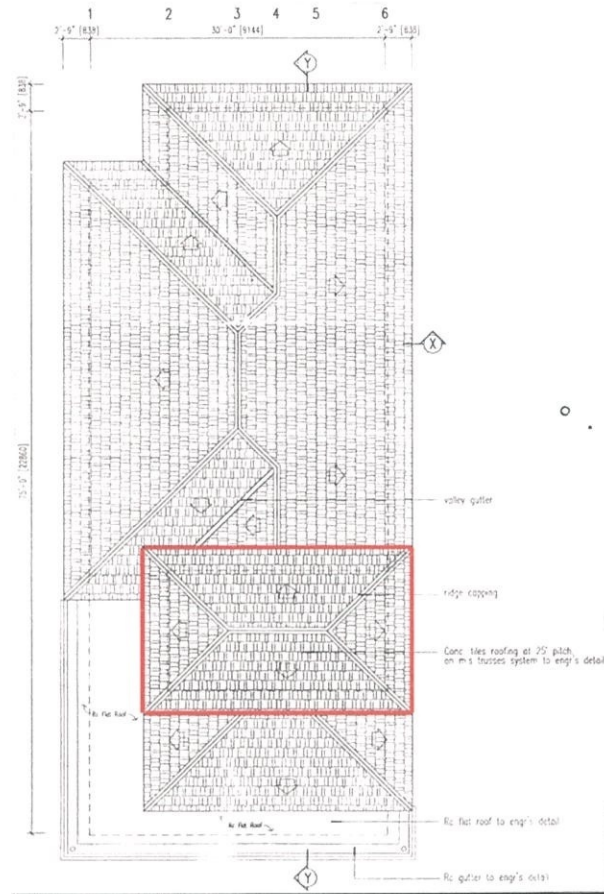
Roof Plan of Bungalow House in Taman Dato' Wan, Ampangan
